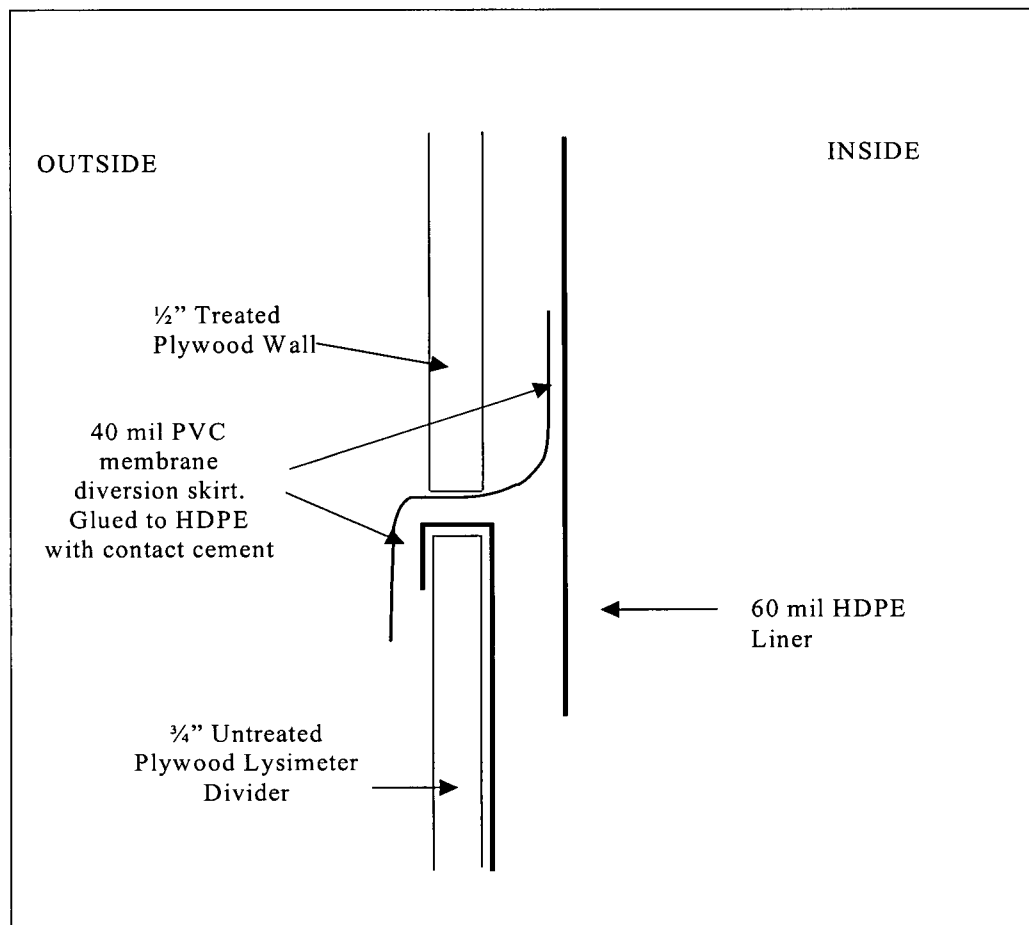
Schematic Cross Section of CPE Wall and Lysimeter Base Overlap
